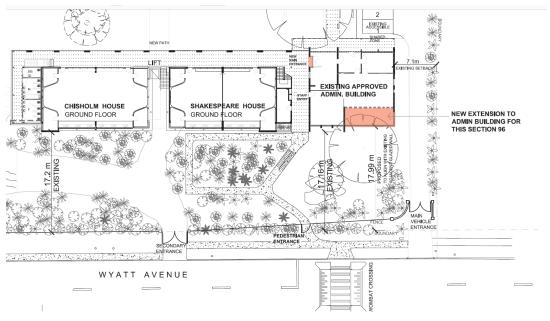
Proposed Site Plan, modifications confined to coloured areas (Source: Templum)
